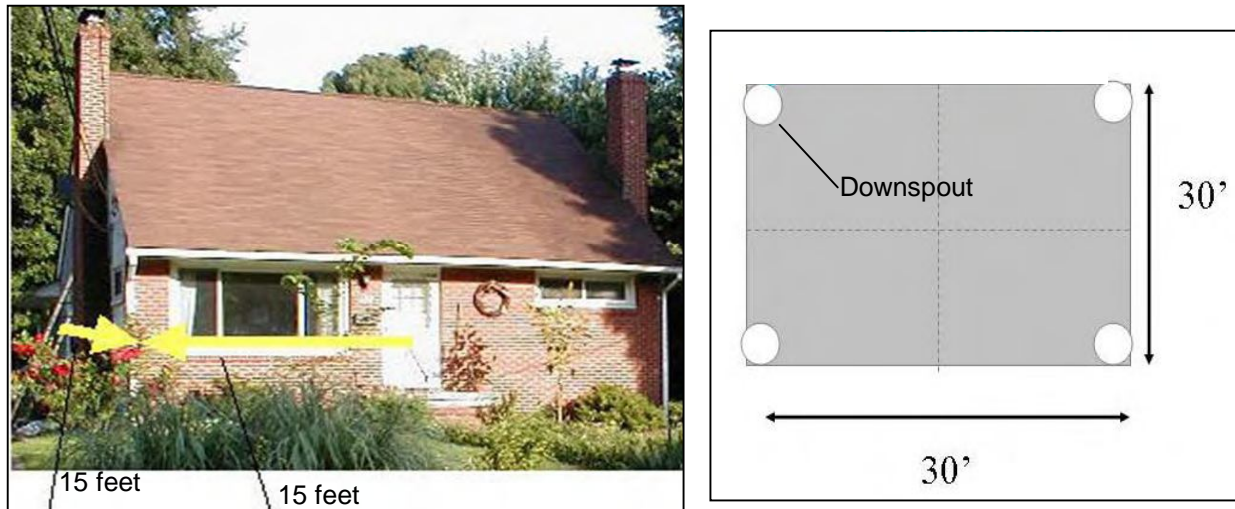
Sizing of residential retrofits is based on simple measurements of roof area draining to each downspout.
